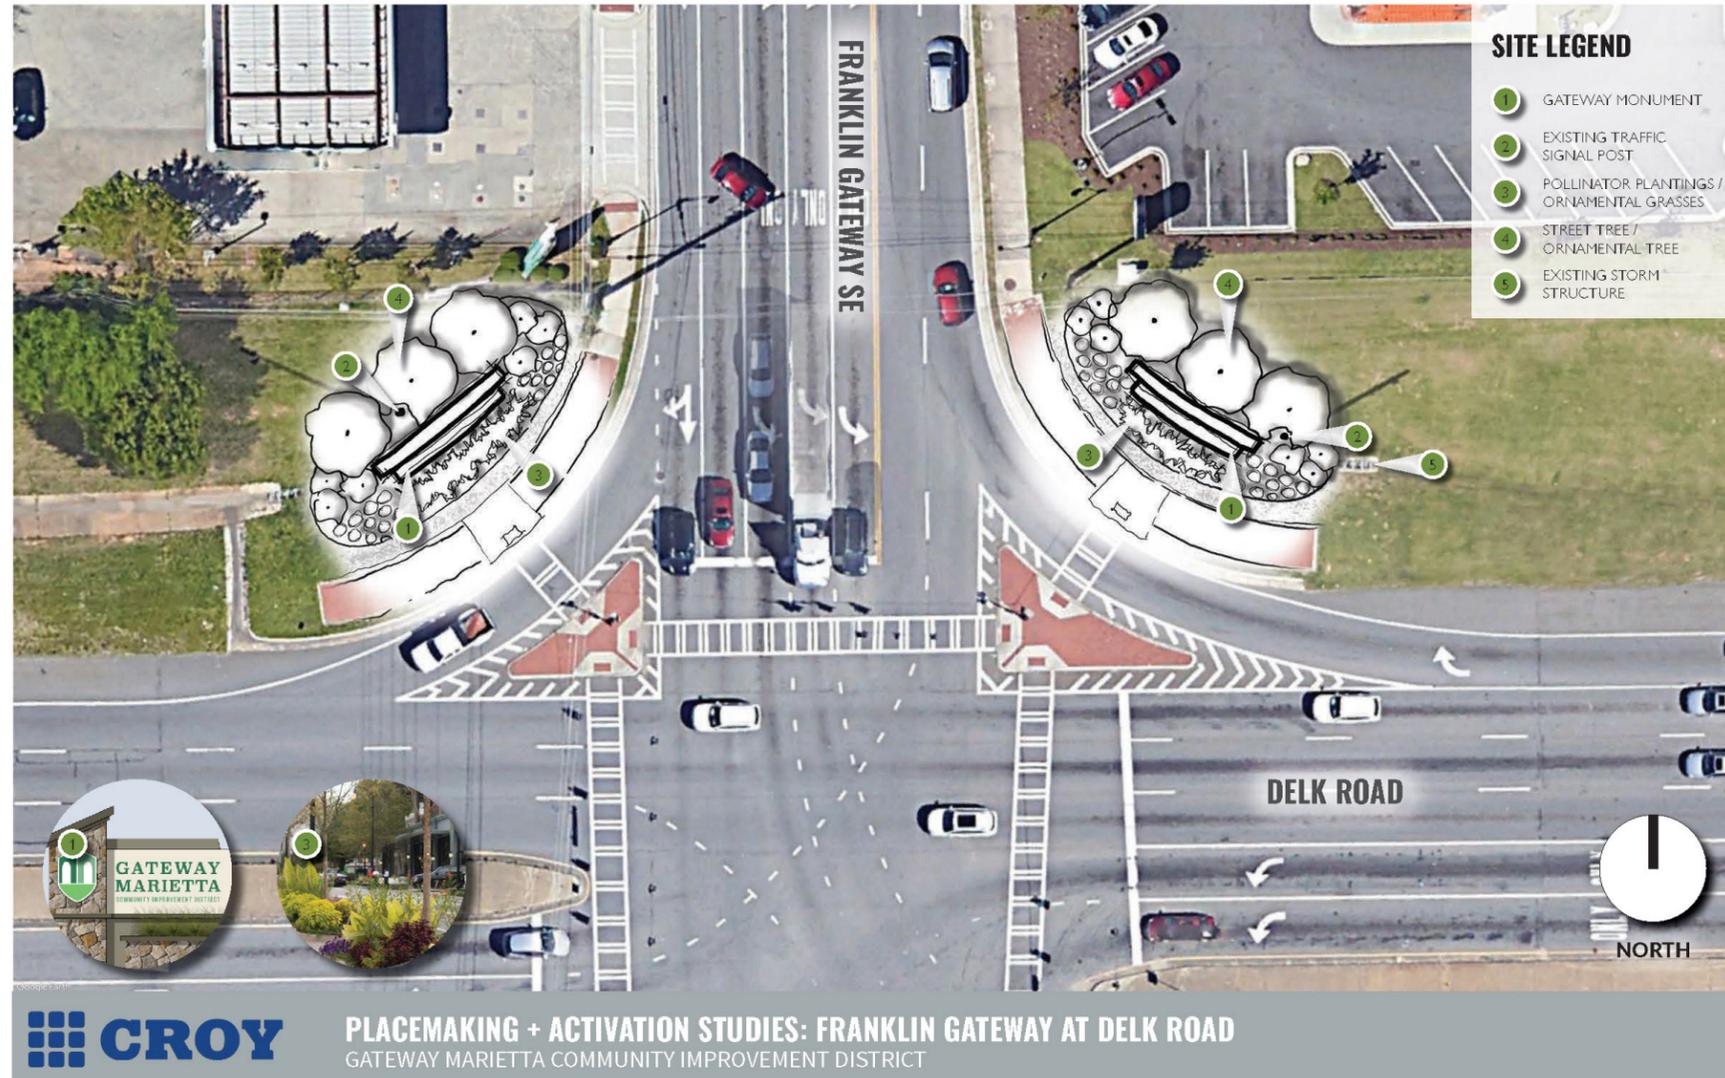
Placemaking Plan - Franklin Gateway at Delk Road
